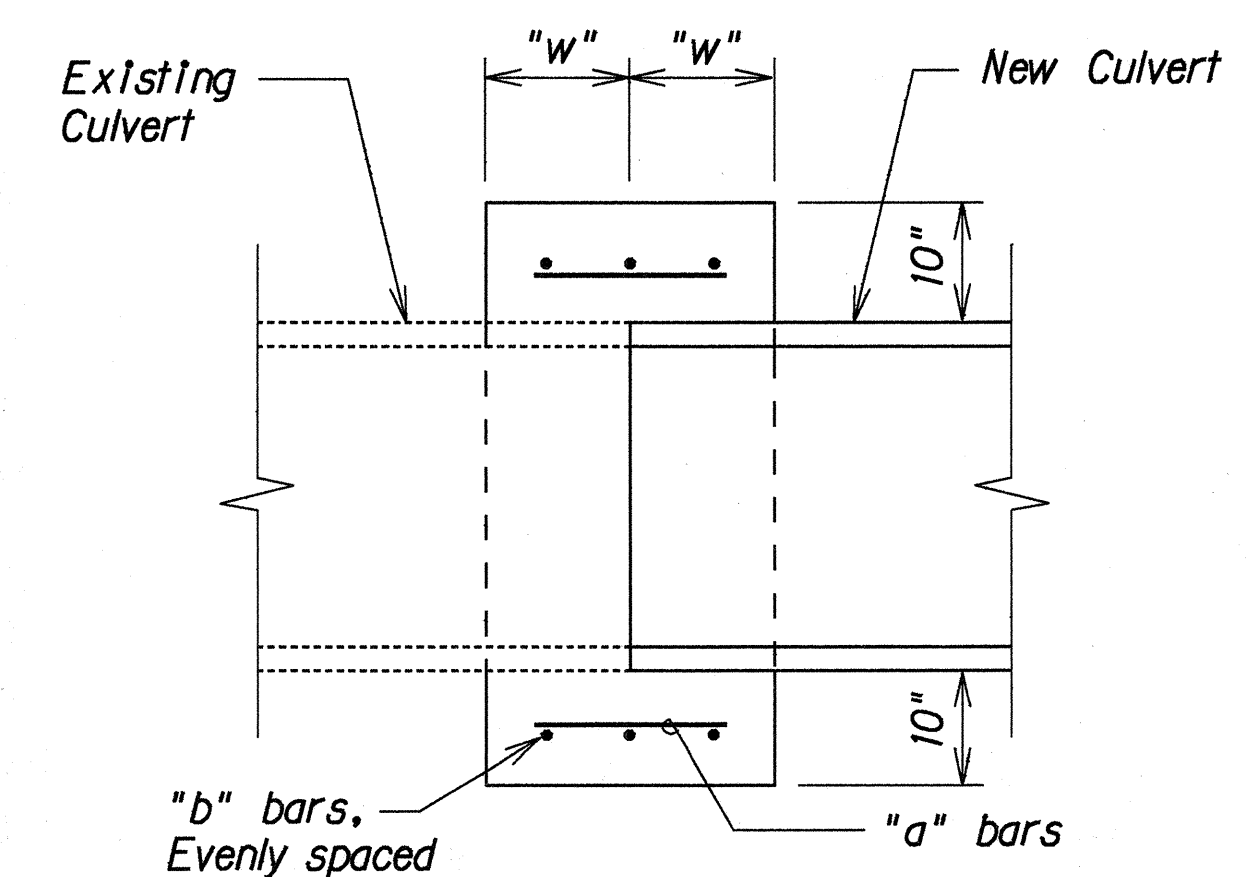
DETAIL - TYPICAL CULVERT EXTENSION DETAIL
